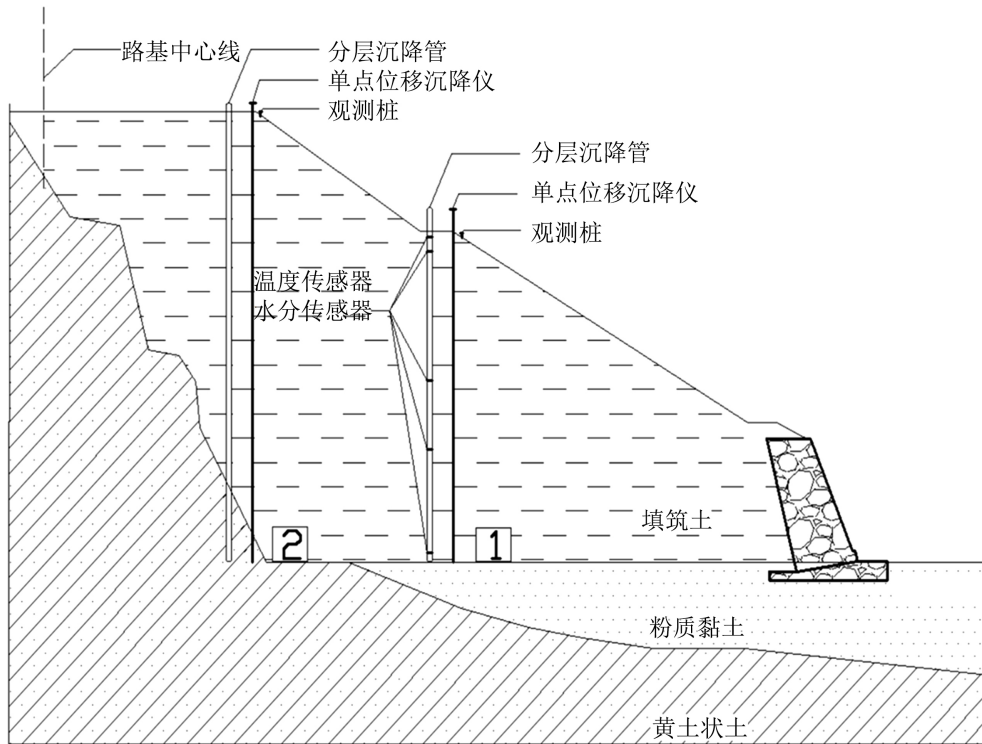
Elevation view of overall monitoring instrument layout of high-filled embankment
